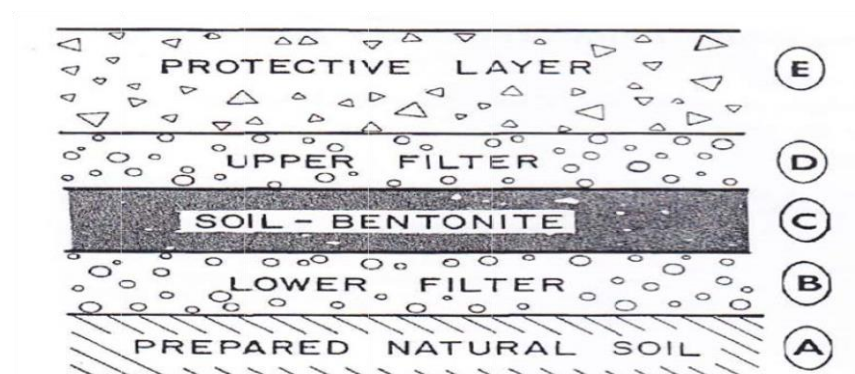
A typical cross section area of soil-bentonite liner (After Chapuis 1990)
